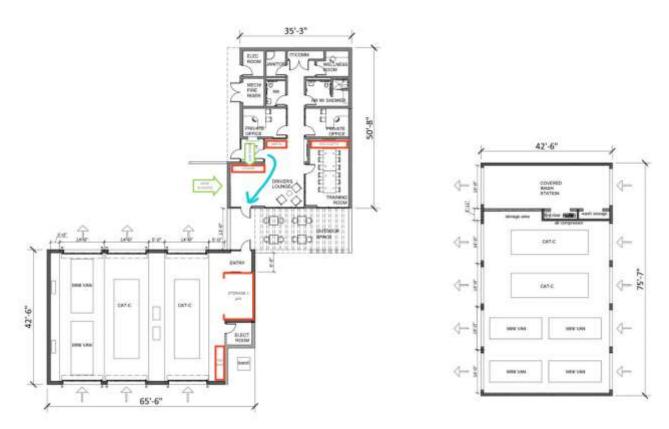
Alternative 1 Bus Barn, Bus Shelter and Administration Building Plans with Workshop Notes
